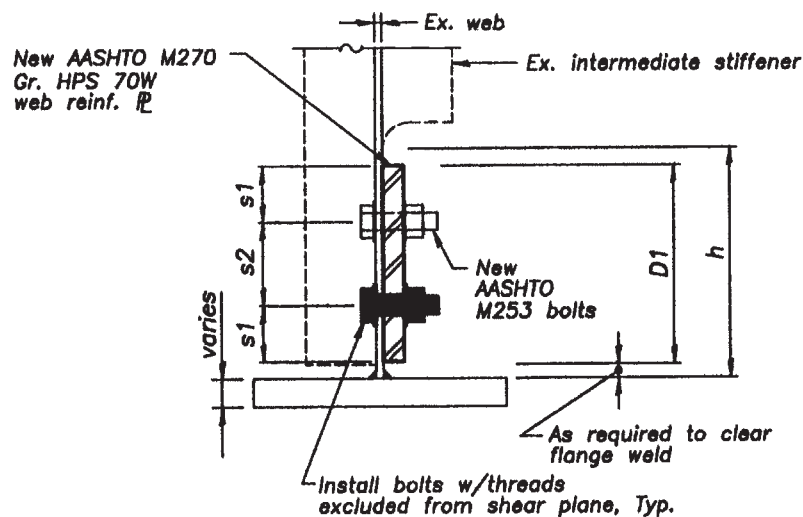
Retrofit redundancy plate bolted to web of existing two-girder superstructure in Poplar Street Bridge complex in East St. Louis. (Courtesy: Wiss, Janney, Elstner Associates.)
